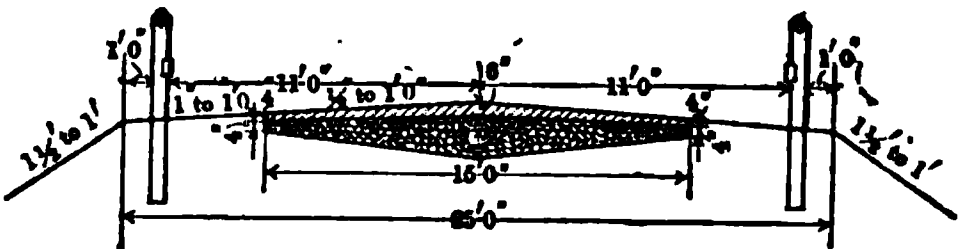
Cross-Section of Broken Stone Road on a V-Drain Foundation Constructed on an Embankment
